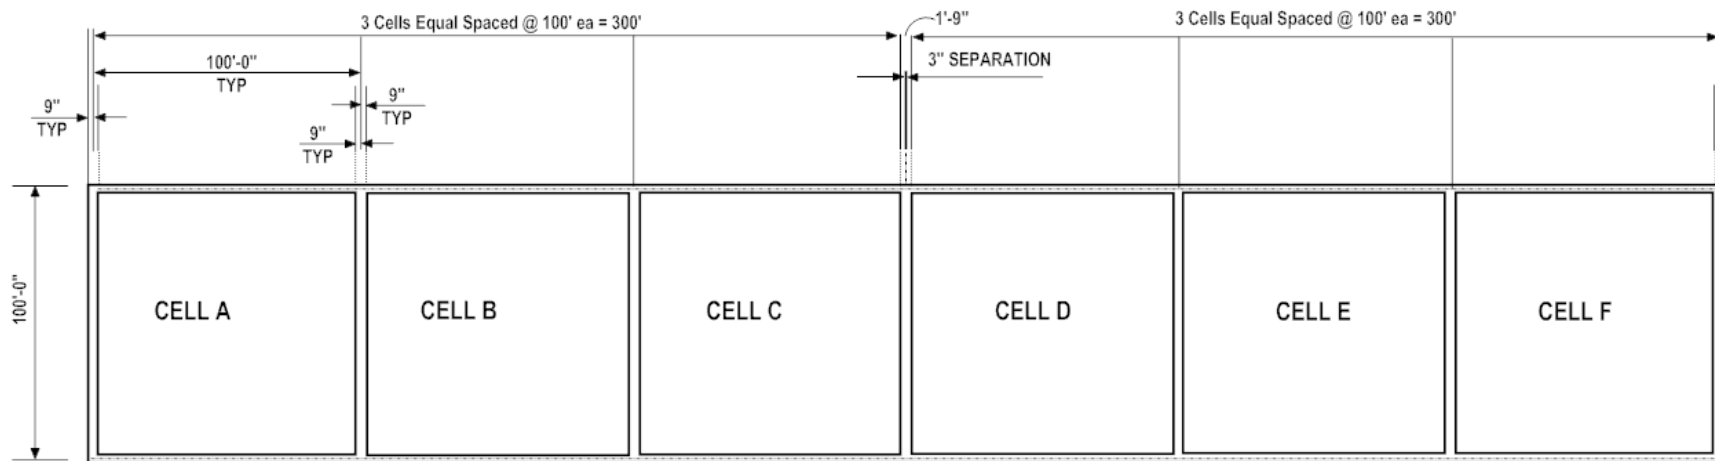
Vault 1 and Vault 4 Arrangement after Initial Construction
